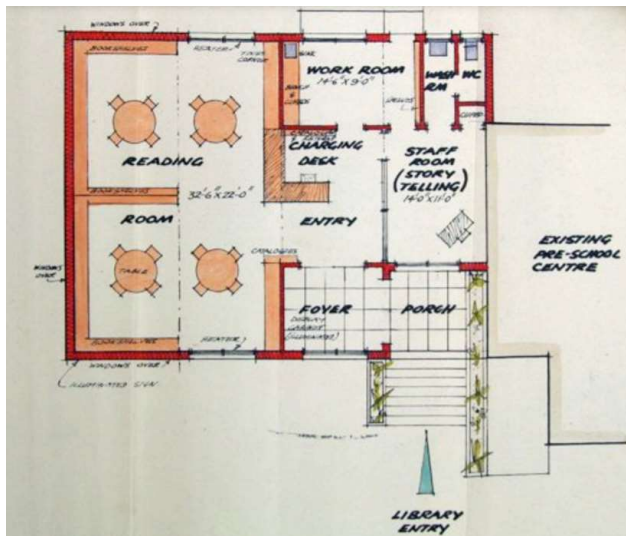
Sketch plan for the Children's Library prepared by local architectural designer David L Woodger in June 1960, showing existing pre-school building to the right. (Source: Public Building Plans File No.5841 Plan No.4057, Unit 413, VRPS 8044, PROV, cited in Mills and Westbrooke 2010: 15)
